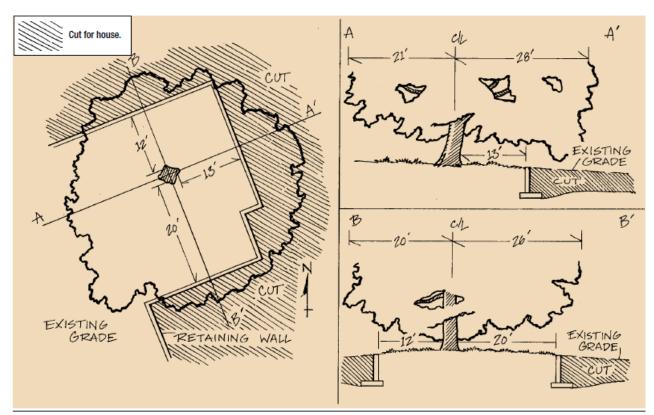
Information from a tree report and tree preservation plan can be used to prepare plan and elevation drawings of proposed construction impacts to trees. These drawings help developers visualize the impacts soil compaction and required limb and root pruning will have on trees.
